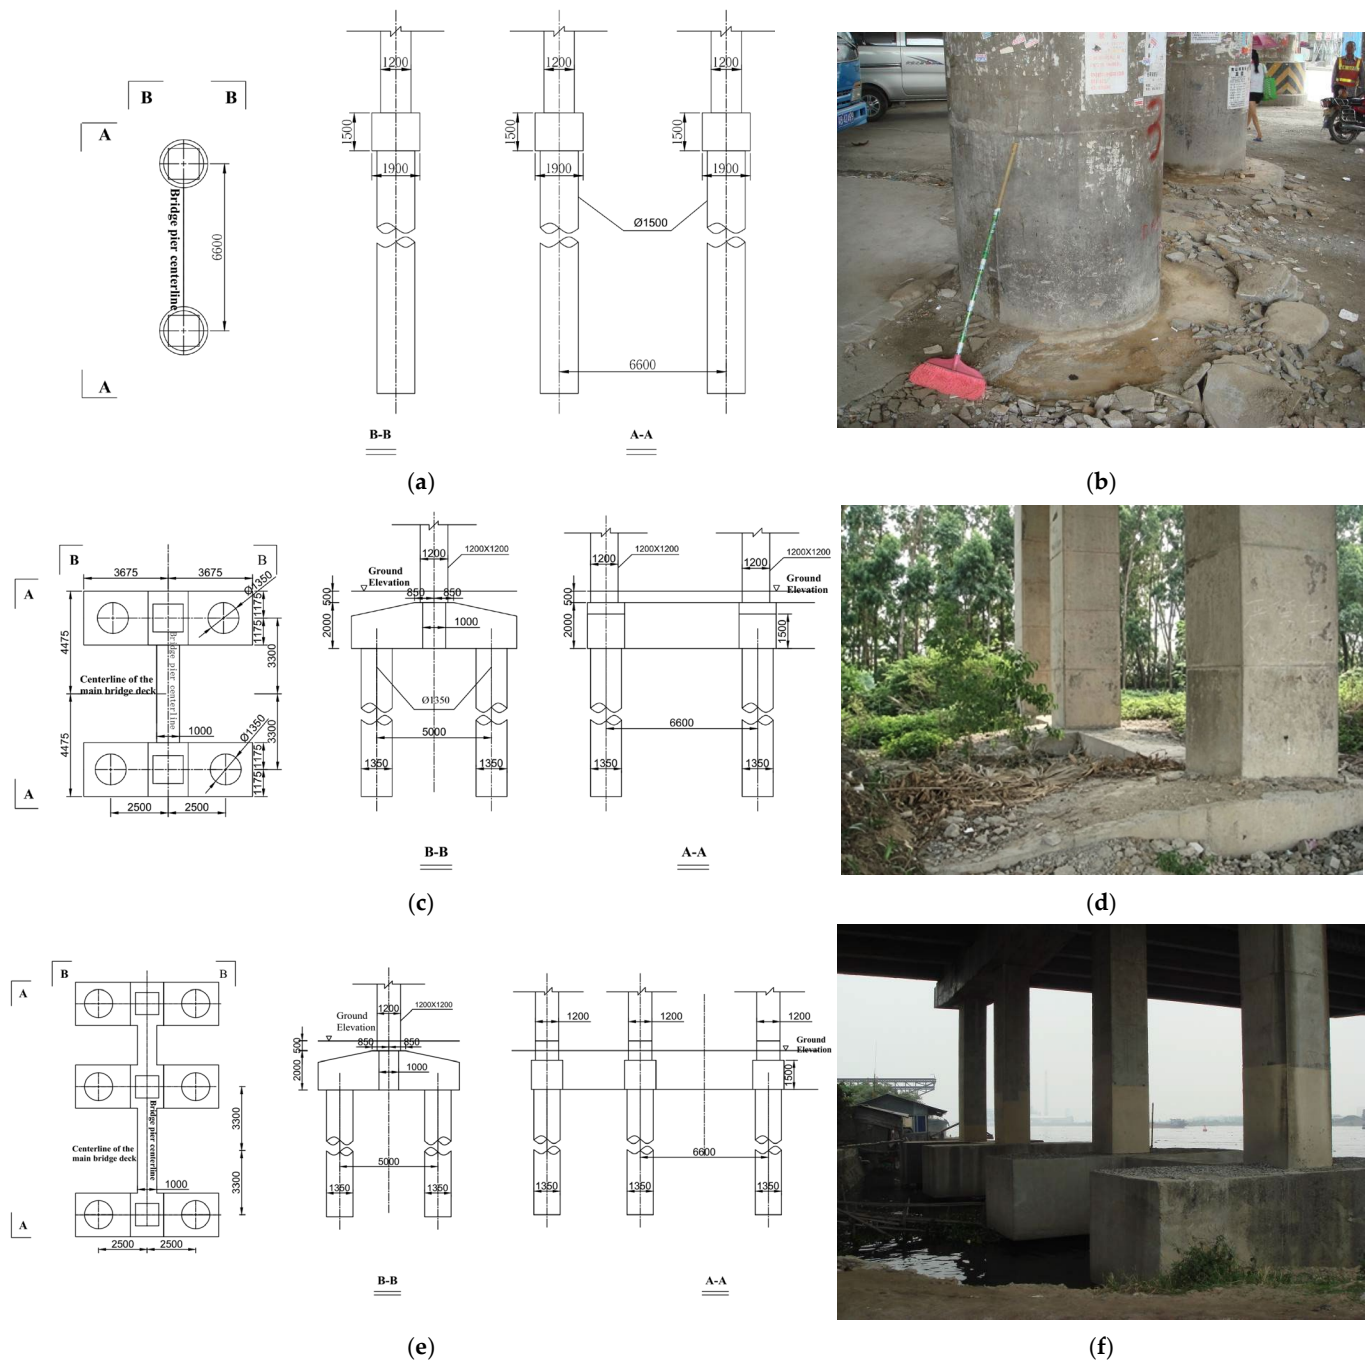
Three types of bridge pier sections (unit: mm). Type A: (a) schematic drawing and (b) photograph. Type B: (c) schematic drawing and (d) photograph. Type C: (e) schematic drawing and (f) photograph.
